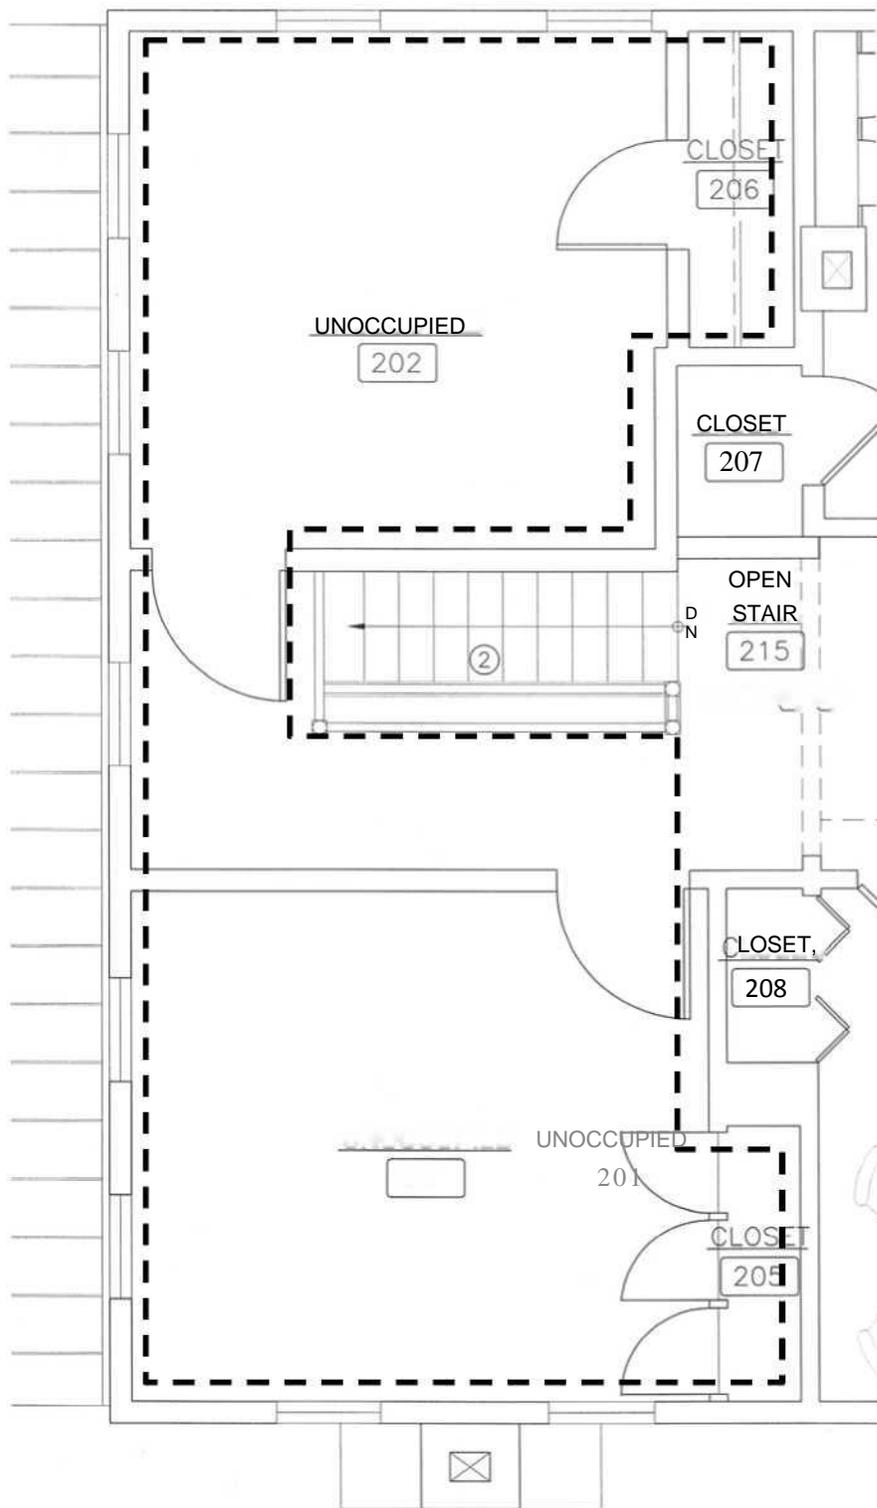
Second Floor Joists Below Front Bedrooms Are Inadequate
